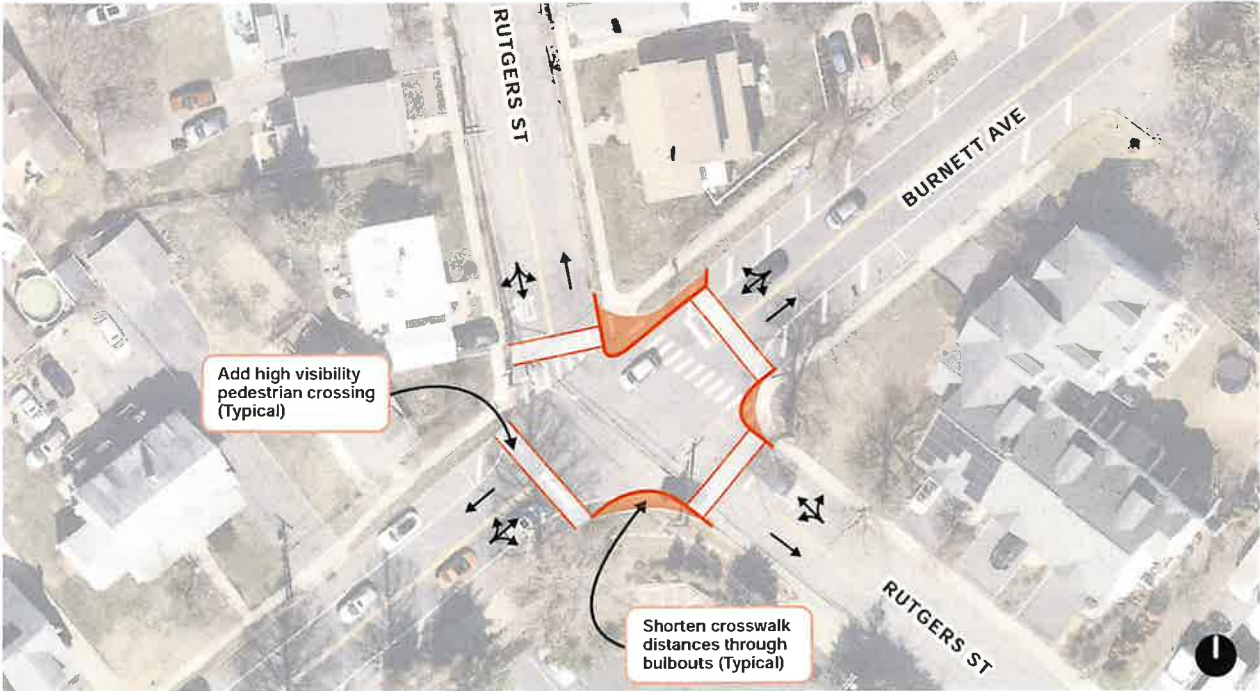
Conceptual Plan for the Intersection at Burnett Avenue and Rutgers Street
